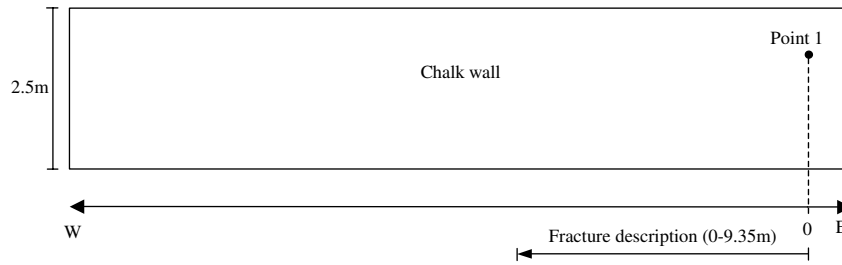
Sketch of the excavated chalk wall (2.5 m high and 25 m long).
